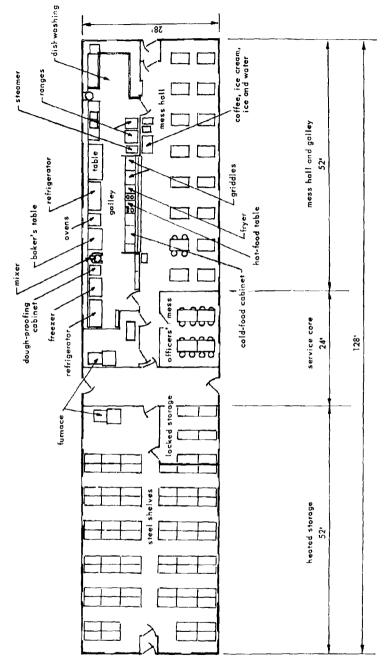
Building No. 3, storage — mess hall and galley floorplan.
